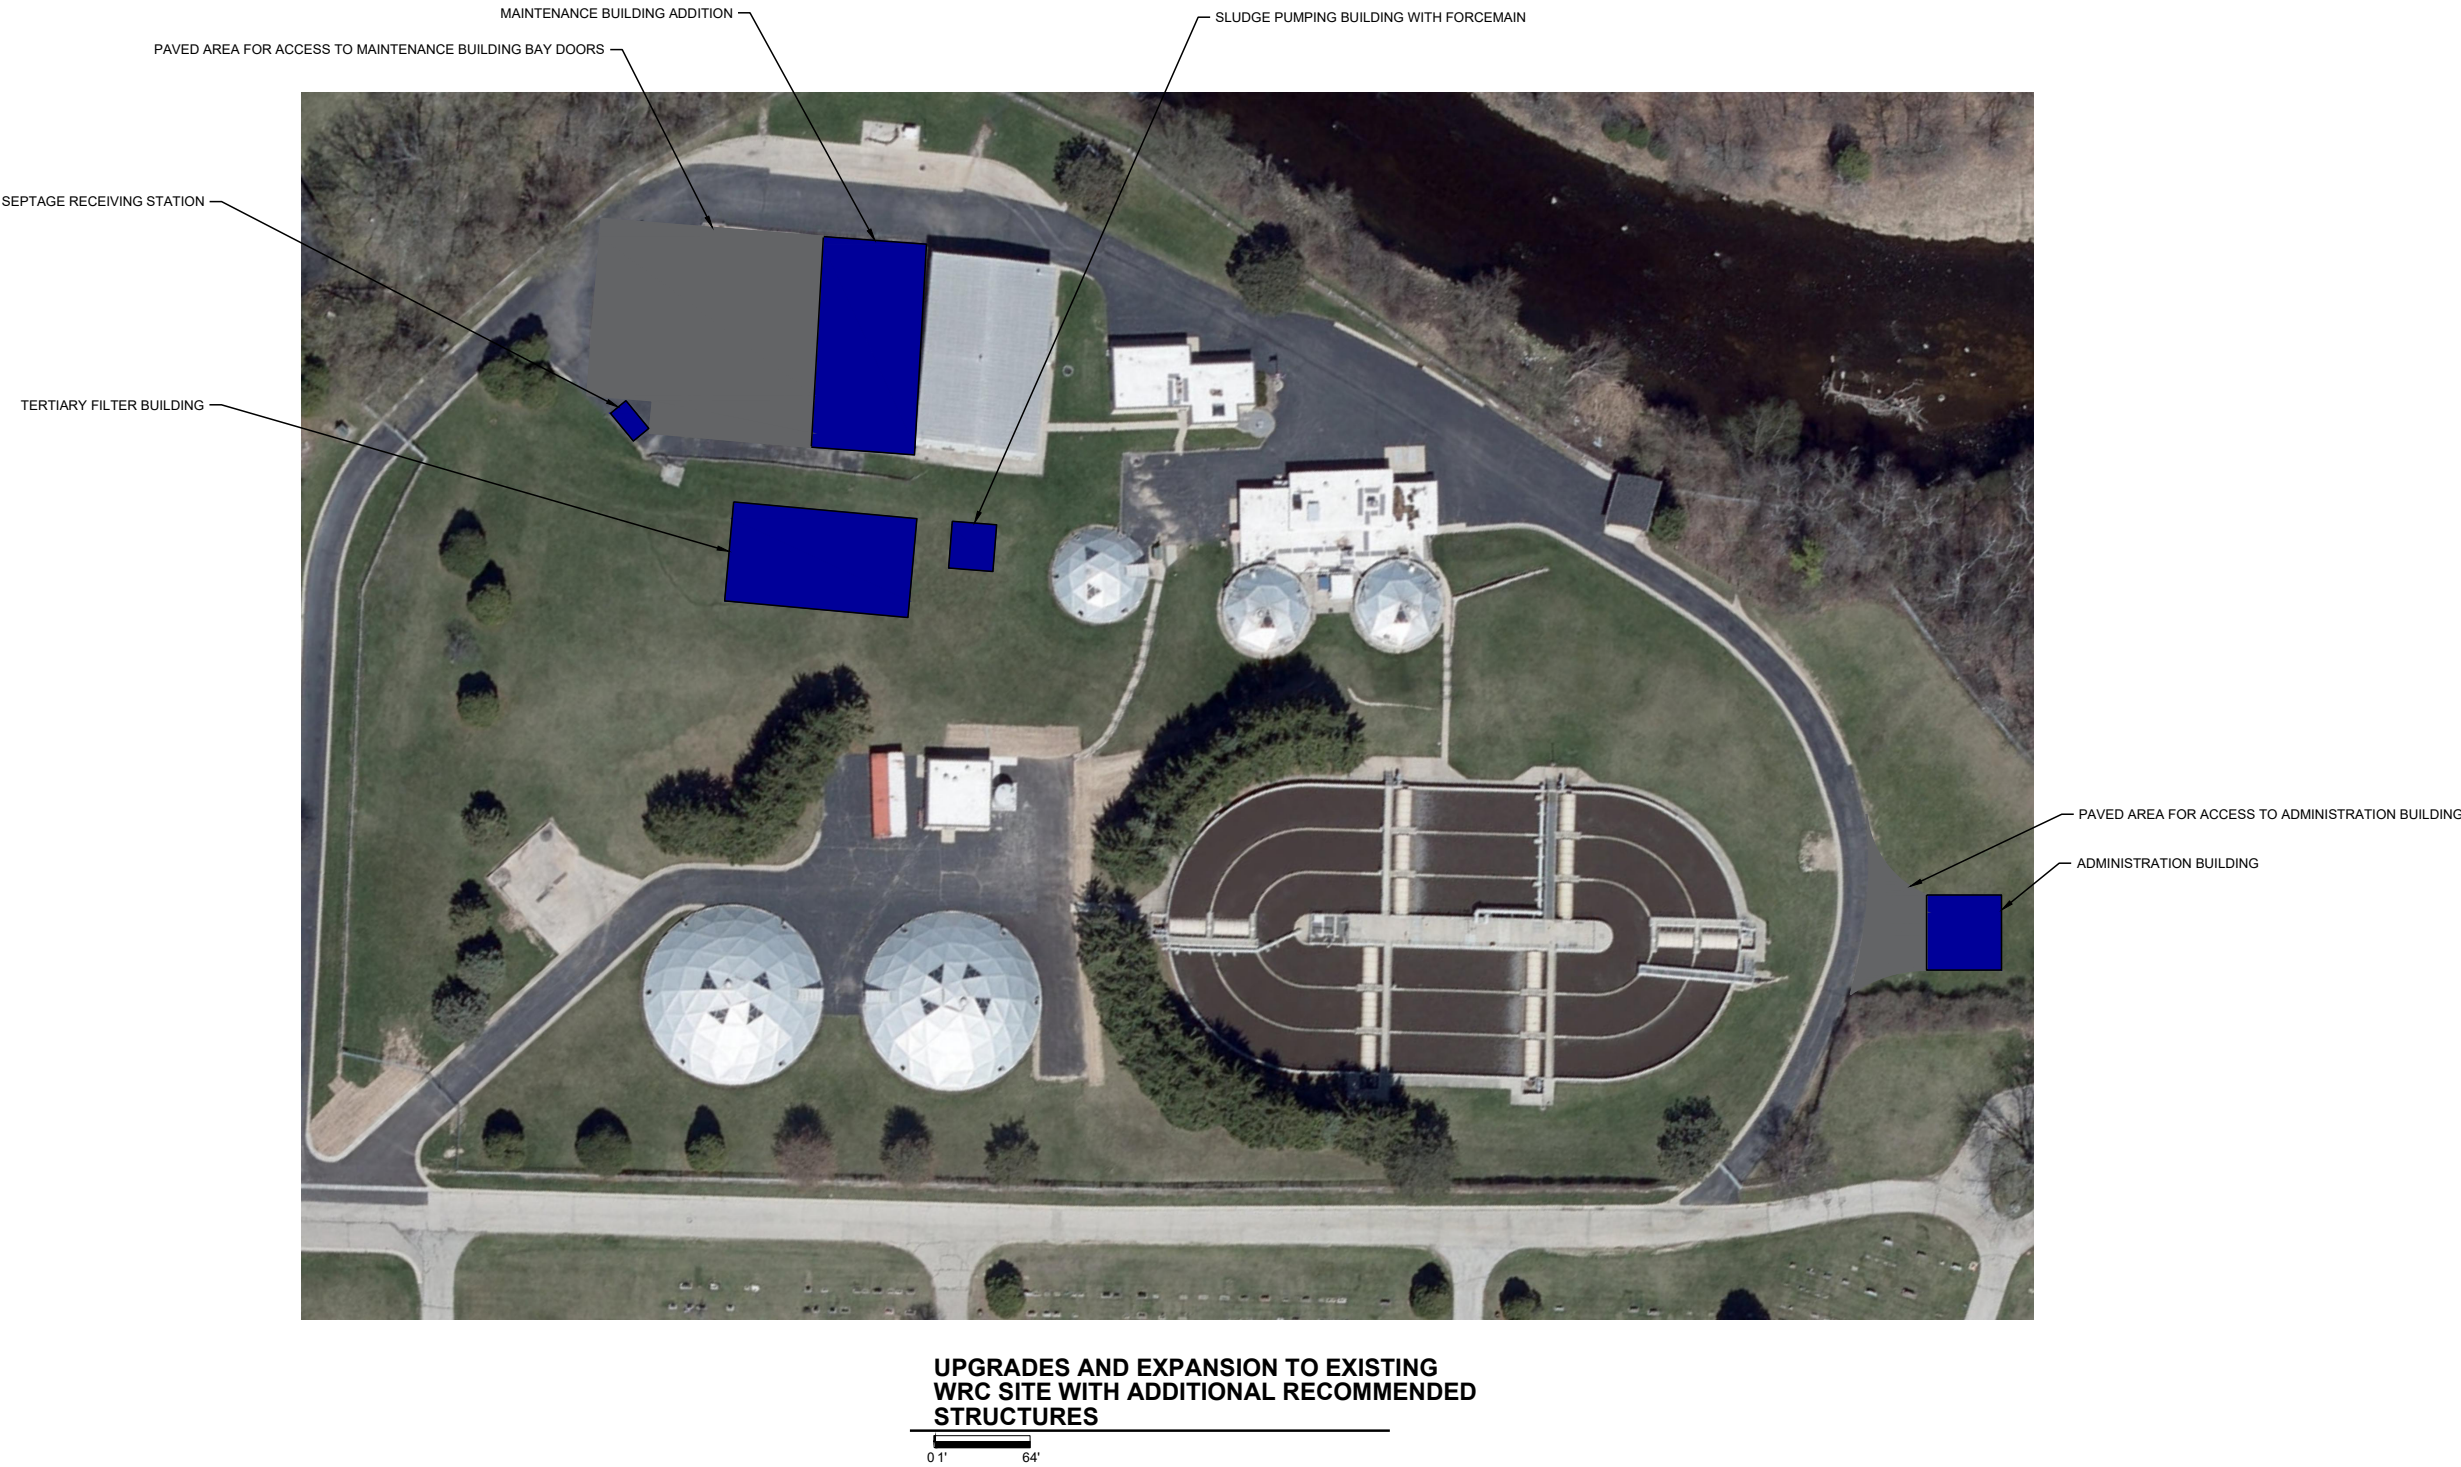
and 5-3 display conceptual site plans with new structures identified in Table 5-1 shown on the existing WRC site and the Pioneer Road site.
